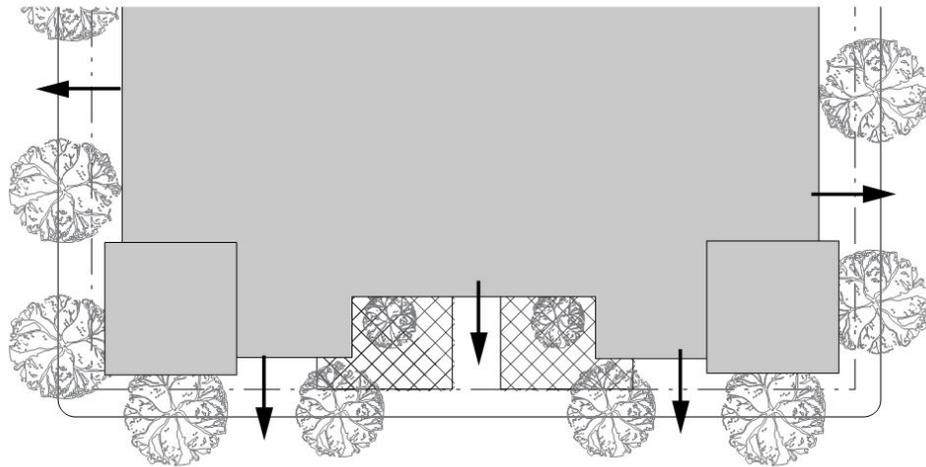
B.5: BUILDING ORIENTATION TO THE STREET
